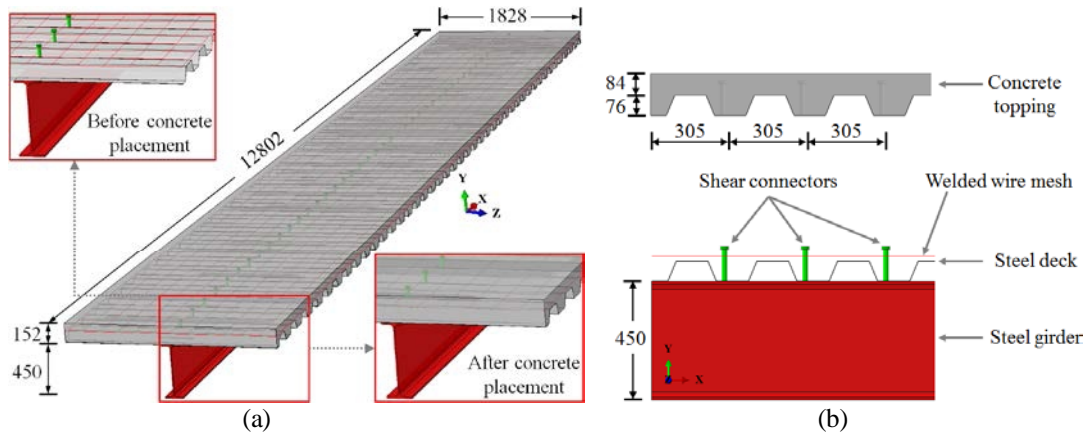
The steel-concrete composite specimen (unit: mm): (a) three-dimensional illustration; (b) profile of the steel deck.
